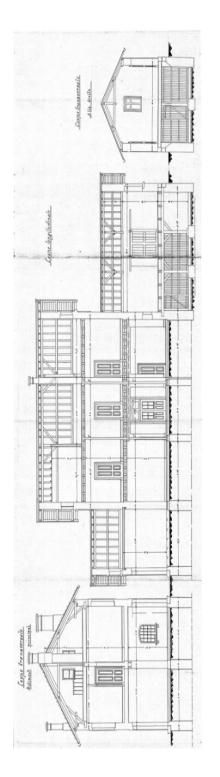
CFOA Company IIIrd Class project / Sections and elevations
